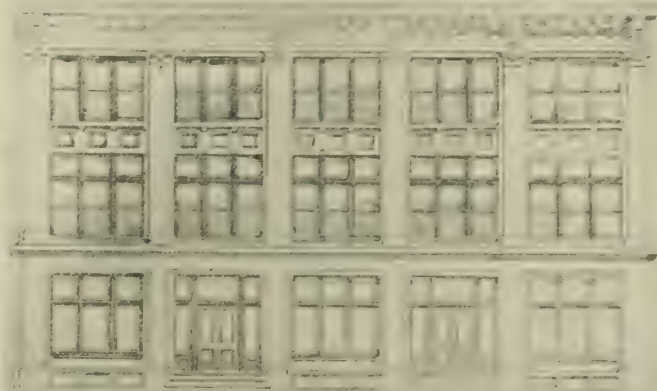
FRONT ELEVATION OF BUFFALO INDEPENDENT TELEPHONE EXCHANGE.
